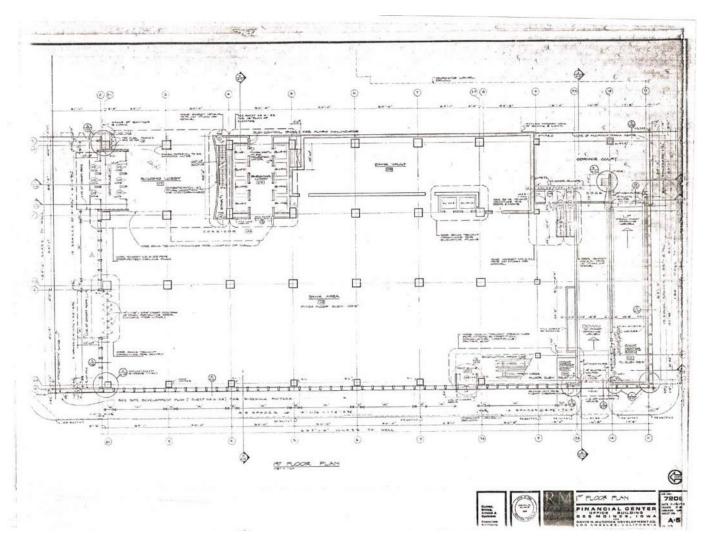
Historic drawing of Financial Center first-floor west wing shell and core plan, oriented with plan north at left, dated 1972. The shell and core included the shared central lobby and elevators at upper left of plan and rear parking garage entrance and exit; the balance of the plan was private tenant space for lowa-Des Moines National Bank, including the banking hall. (Financial Center Office Building drawings, Russell McCaleb, architect, Guirey, Srnka, Arnold & Sprinkler associated architects).
